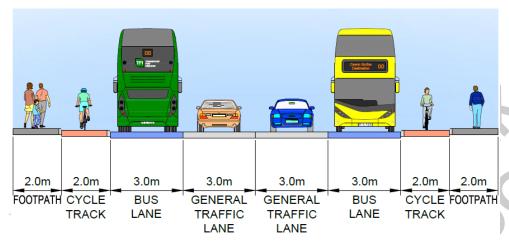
Section 1, Proposed Option 3 - Cross Section A-A
